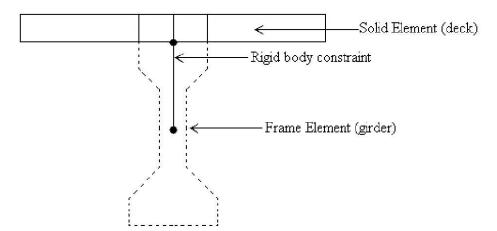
Cross-Section showing Solid element deck and Frame element girder.
